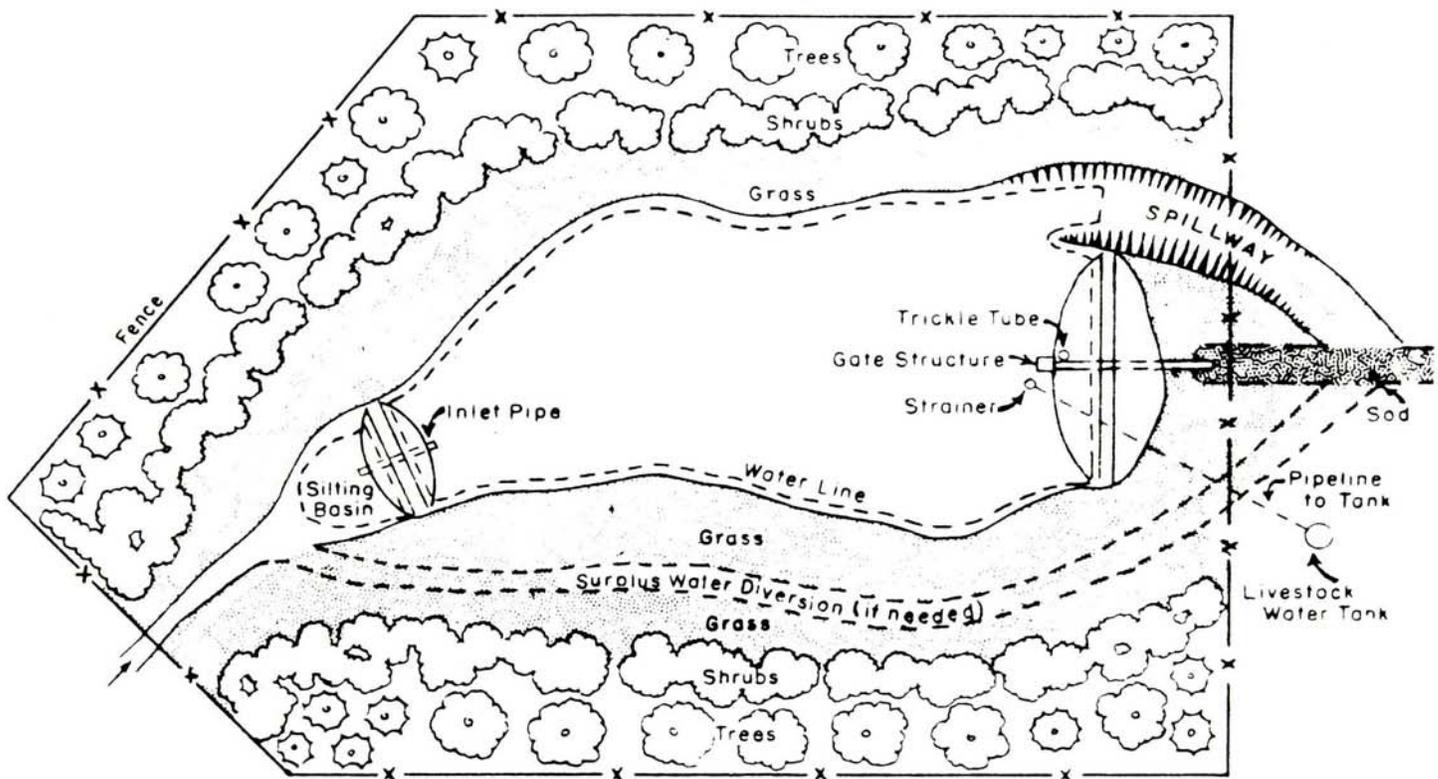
Farm pond lay-out showing location of structures and wildlife planting areas.
